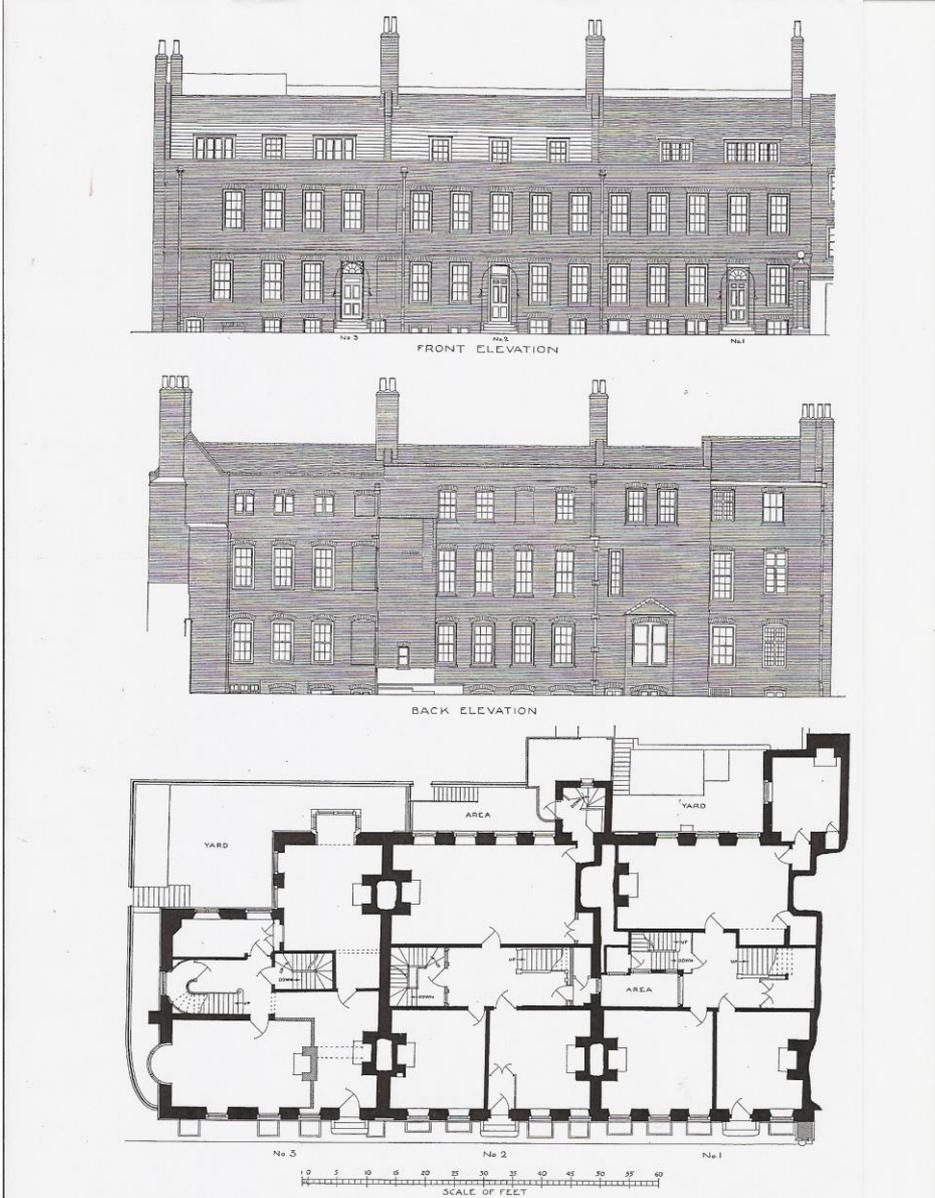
The front and rear elevation and ground floor plans of 1-3 Amen Court.
